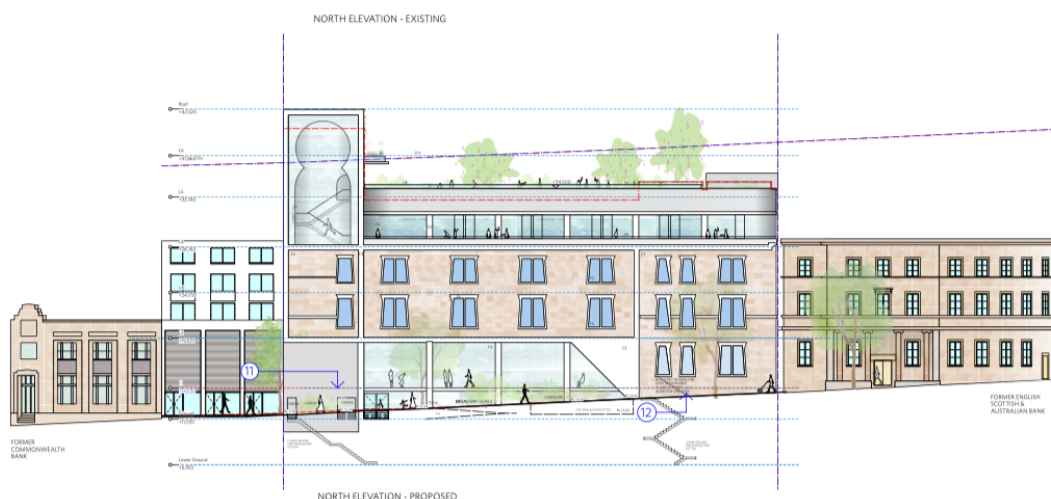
Proposed North Elevation (Durbach Block Jagers)
